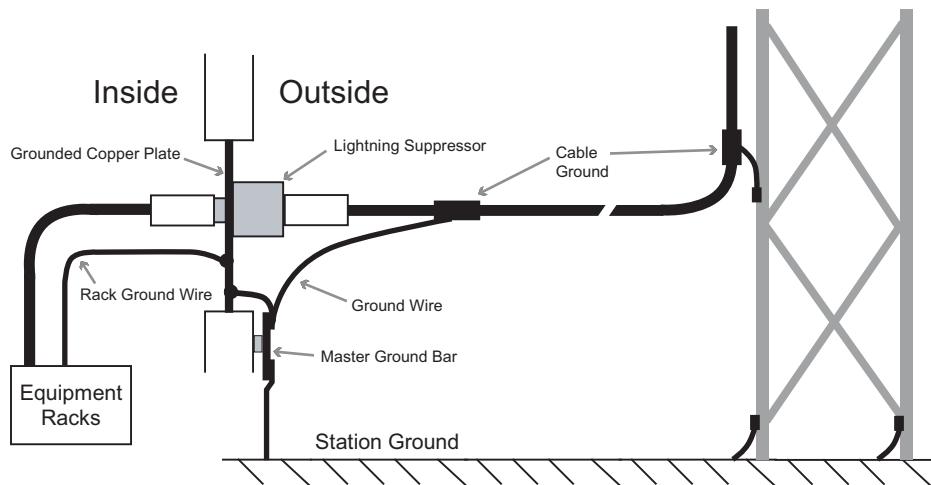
shows the suppressor installed indoors, where it should be located close to the building entry point and must be earthed to the master ground bar. A separate cable ground kit must be fitted to the feeder prior to building entry.
